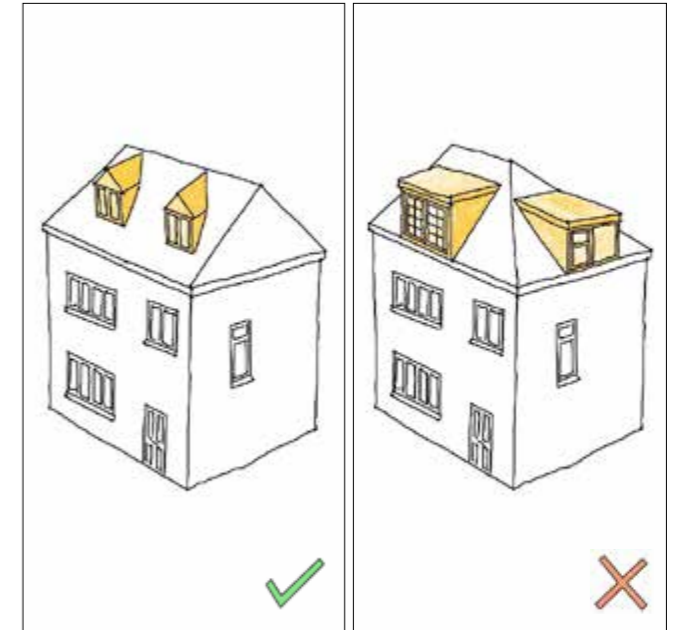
Getting the architectural detail right will be critical for features such as dormer windows
